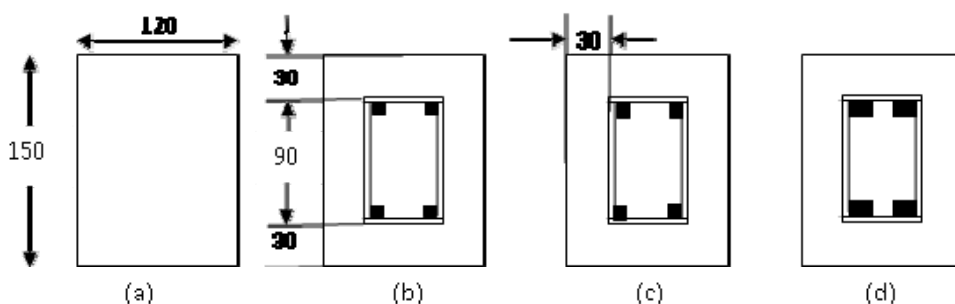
Cross section of (a) Plain concrete beam, (b) 0.73% bamboo reinforced beam, (c) 1% bamboo reinforced beam, (d) 2% bamboo reinforced beam,
